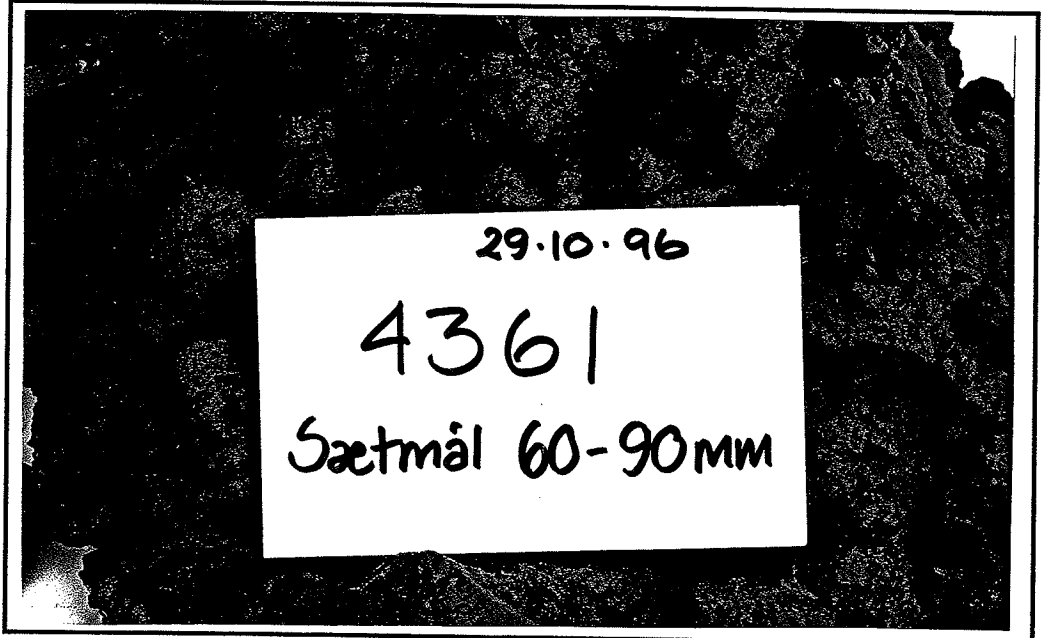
Concrete type applied at test No. 5. (F5, negative No. 9).
